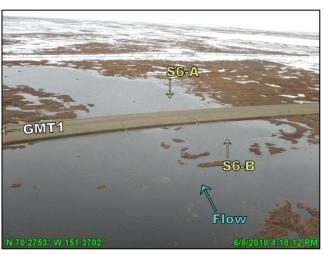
Culverts GMT1-32 and GMT1-33, looking north; June 8, 2018
